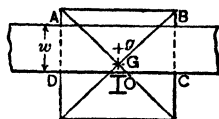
Square Supporting Area. Wall and Eccentric Isolated Load
